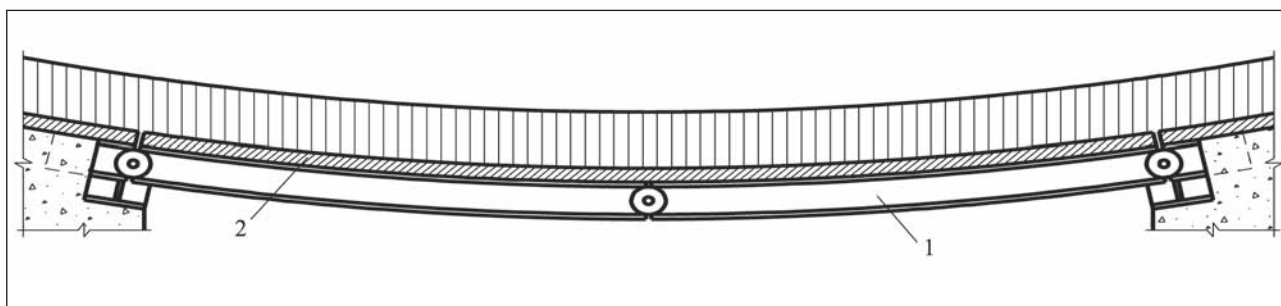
Advanced structure of suspension pedestrian bridge: 1 – “rigid” cable, 2 – deck structure
